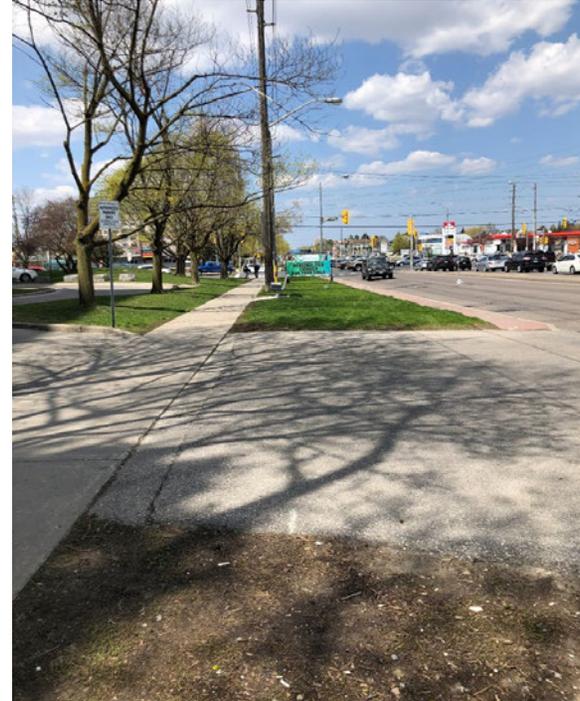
Entry/Exit Pit on West side of Bathurst St., South of Steeles Ave West (looking north)
